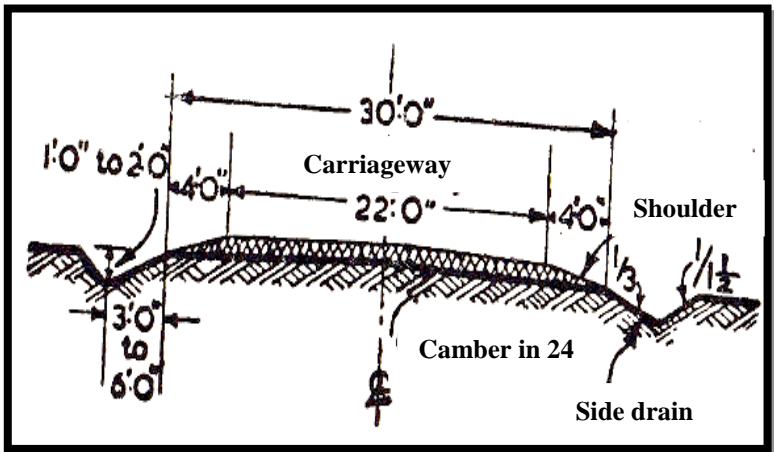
Typical Cross Section of a Sand Clay and Gravel Road
